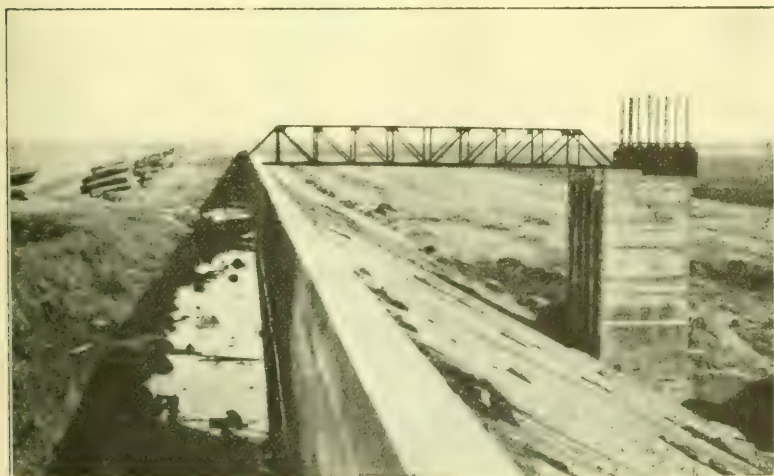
SIDE VIEW OF OUTLET WORKS FROM THE RESERVOIR, SHOWING CONCRETE PROTECTION ON FACE OF EMBANKMENT.
